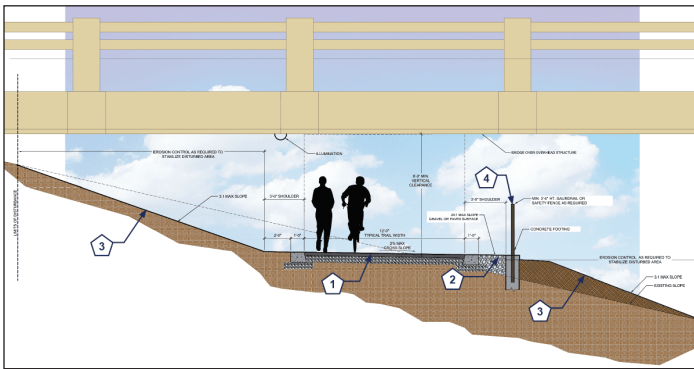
Crossing under I-70 at the south end of Bullivant Park.
